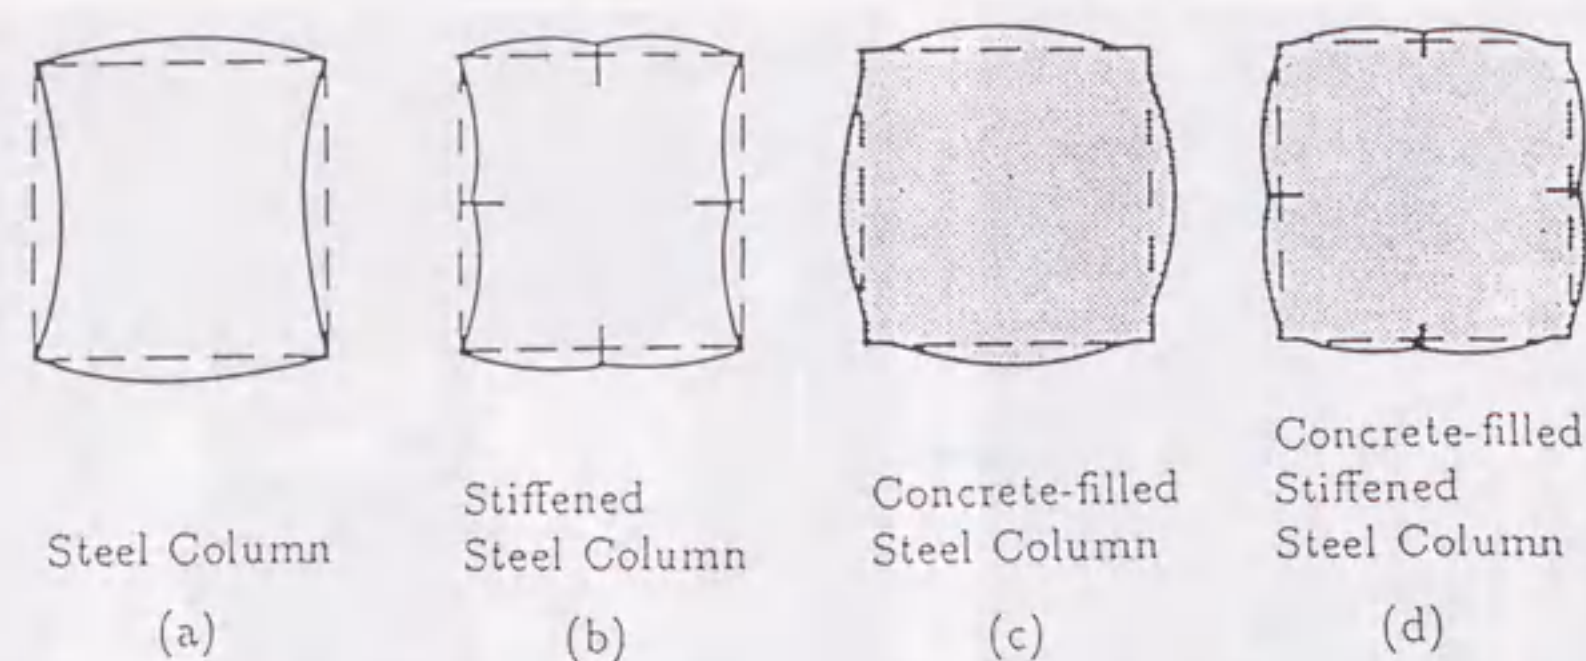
Failure Modes of Test Specimens: (a) Steel Column; (b) Stiffened Steel Column; (c) Concrete-Filled Steel Column; (d) Concrete-Filled Stiffened Steel Column
